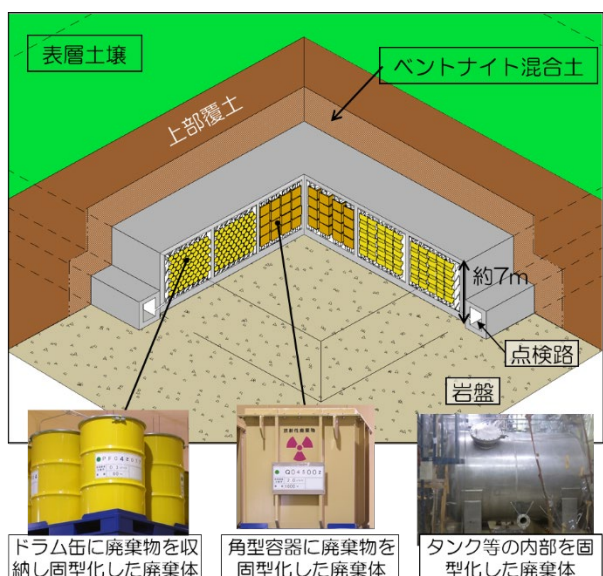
Conceptual view of concrete-pit disposal facility[1, 2]
